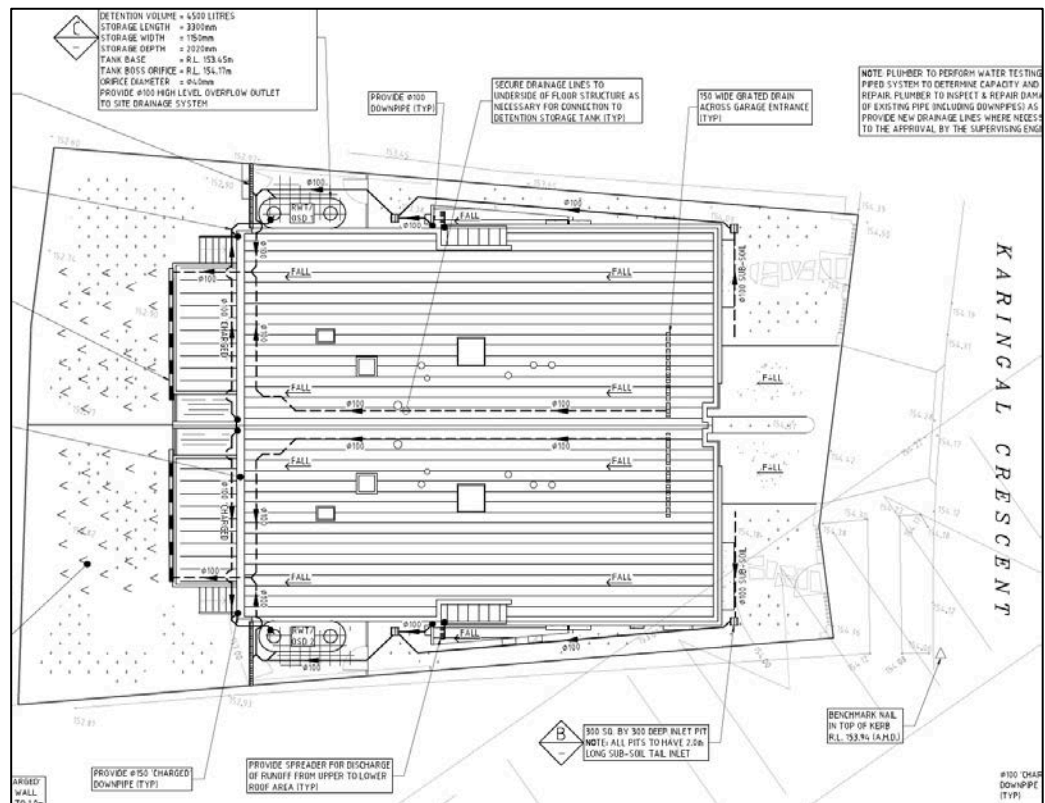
The proposed stormwater plan has overflow discharge into the TPZ of Tree 1 and has no other influence on trees nominated for retention. (Source: Storm Water Management Plan by Taylor 05/03/2025).
